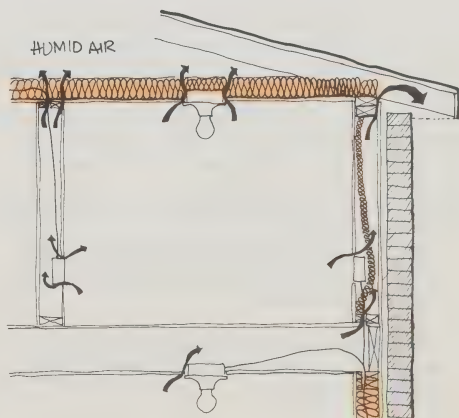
AIR LEAKAGE - THROUGH THE HOLES
